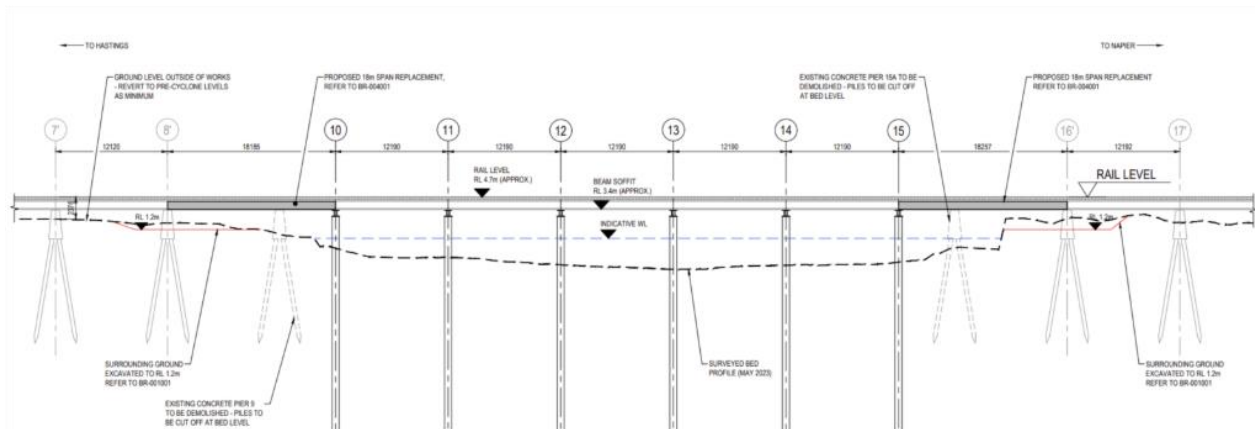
Proposed construction methodology for the span replacement and pier removal
